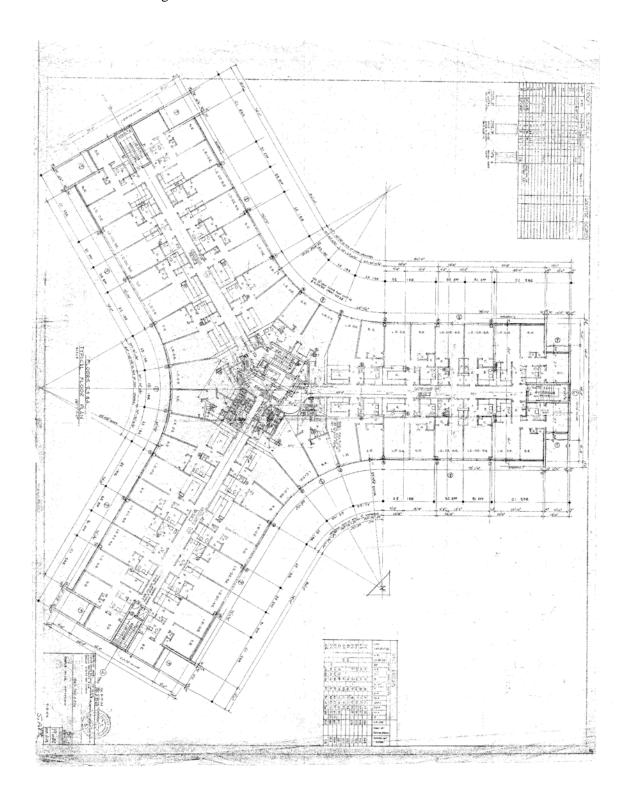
Floorplan, 5<sup>th</sup> to 10<sup>th</sup> floors Collection of the Wedgwood
